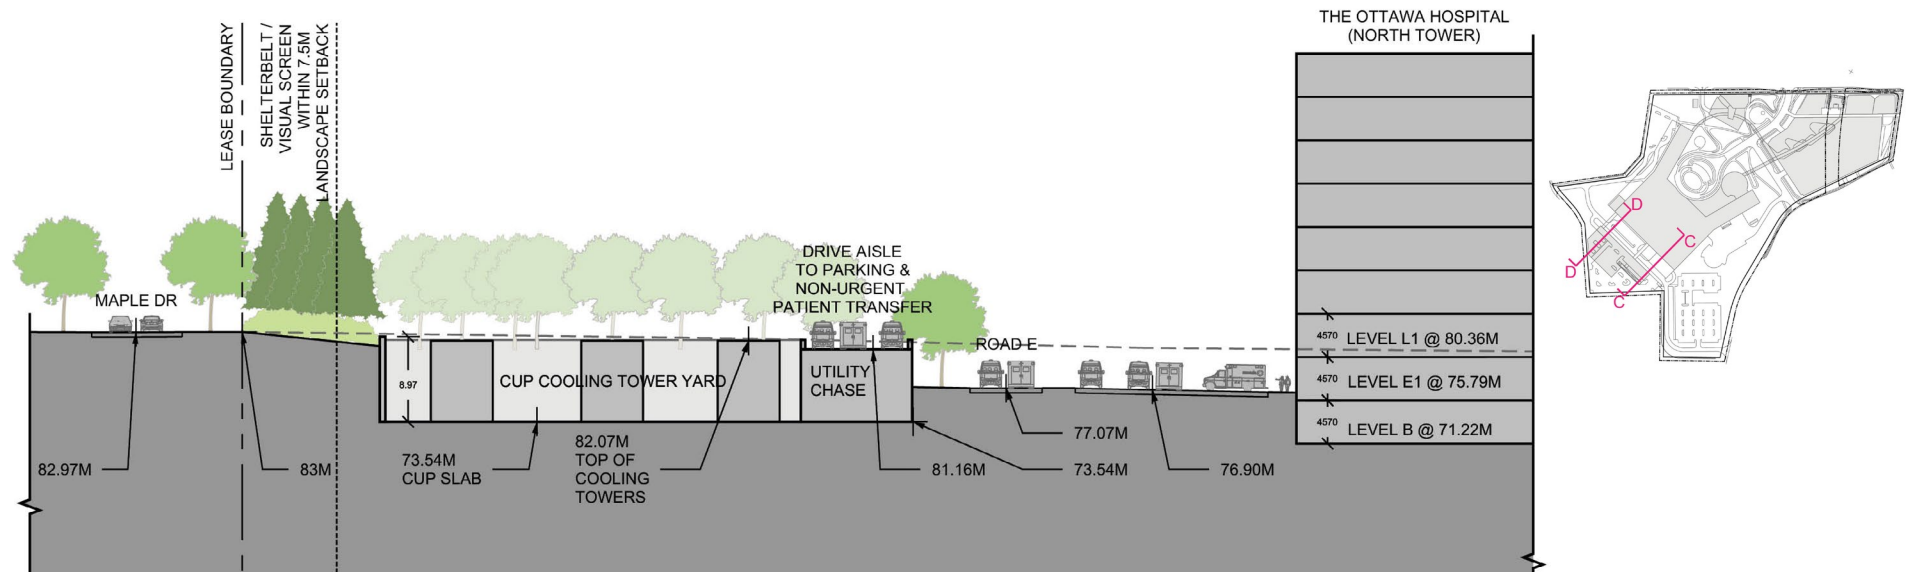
Section D Looking North at Maple Drive Along Preston Street
